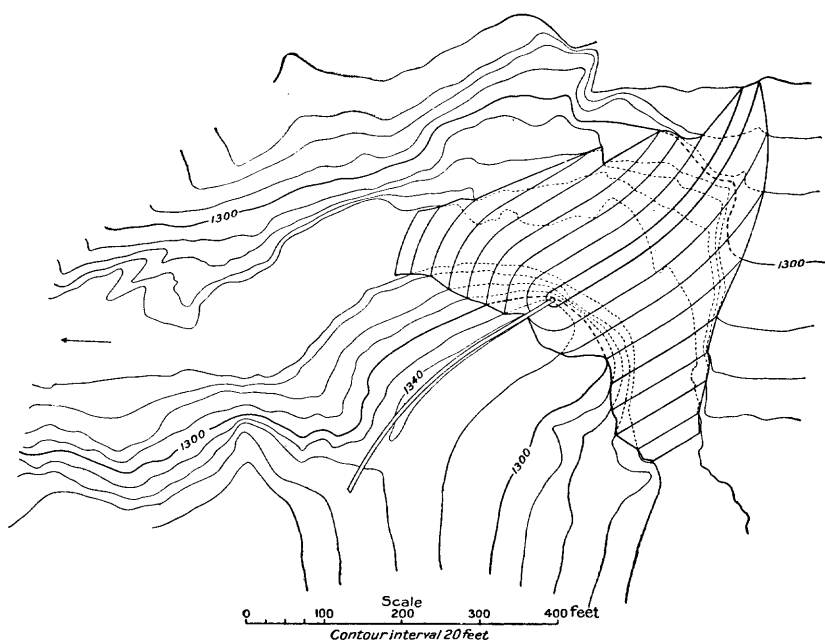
Gibraltar dam site, showing plan for 155-foot rock-fill dam.
